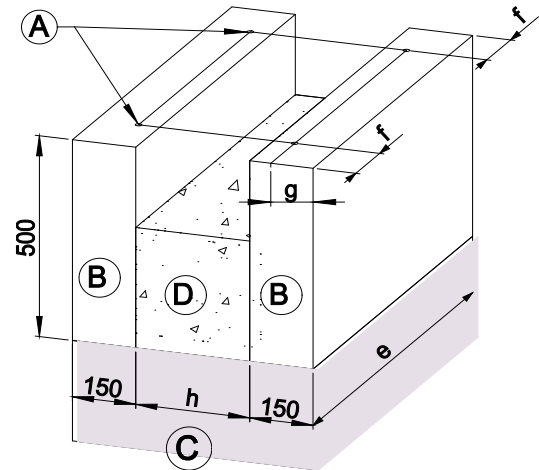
Foundation for securing with floor bracket (dimensions in mm)
